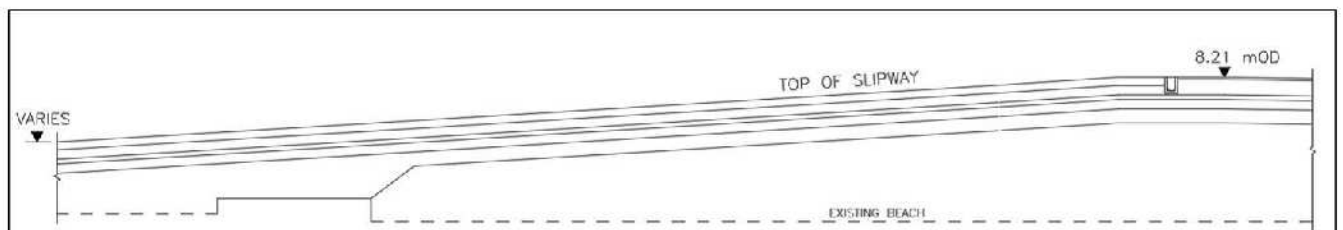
Section-2 (Slipway) – Typical Structural Details (not to scale).
